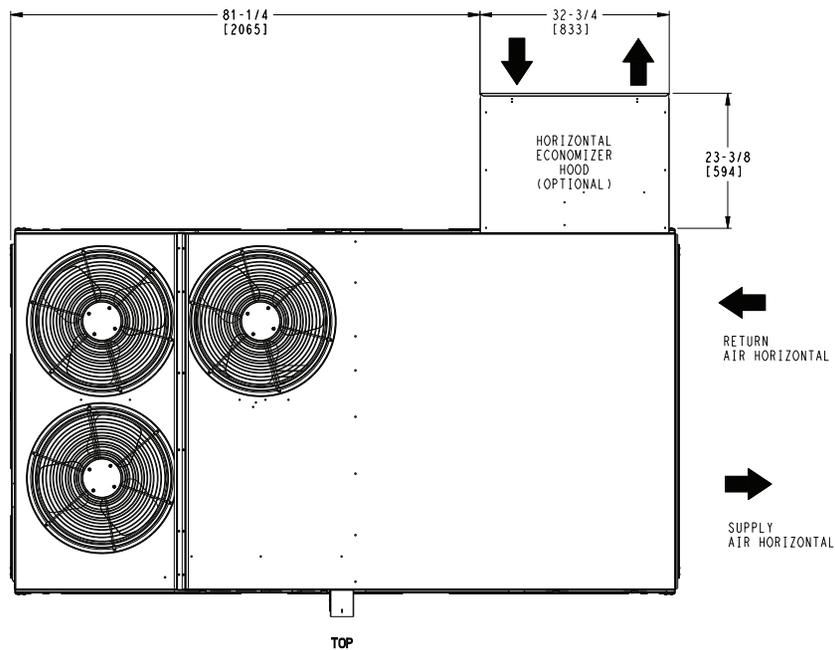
Unit Dimensional Drawing, Size 12, Single-Zone Electric Cooling with Gas Heat
